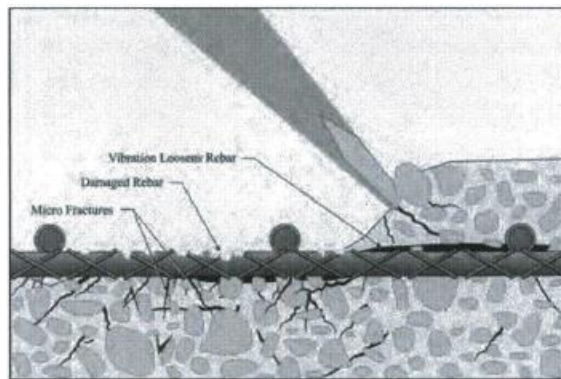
Damage from jackhammering the existing concrete (extracted from [47])
